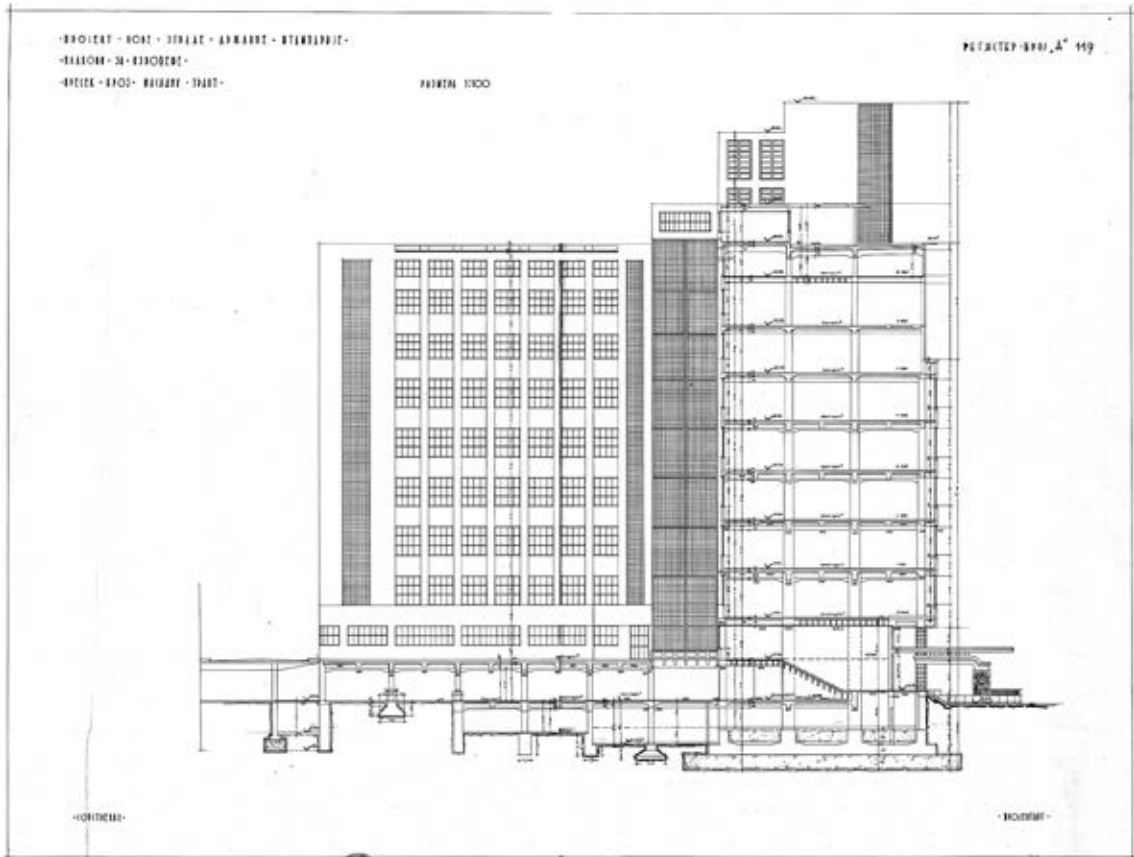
Dragiša Brašovan, *State Printing House* in Belgrade, cross section (Archive of Yugoslavia, Belgrade)
